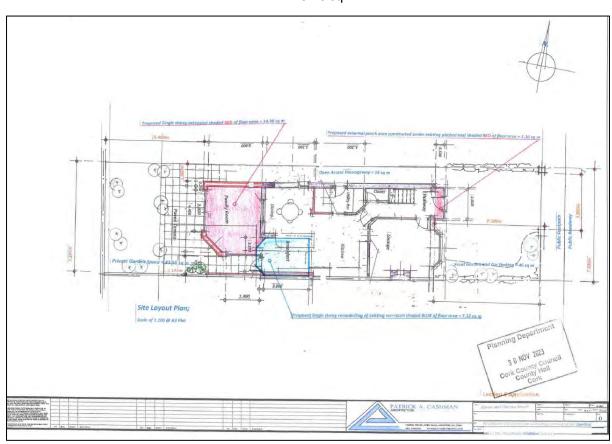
Site Layout Plan for 42 The Woodlands, Midleton.
